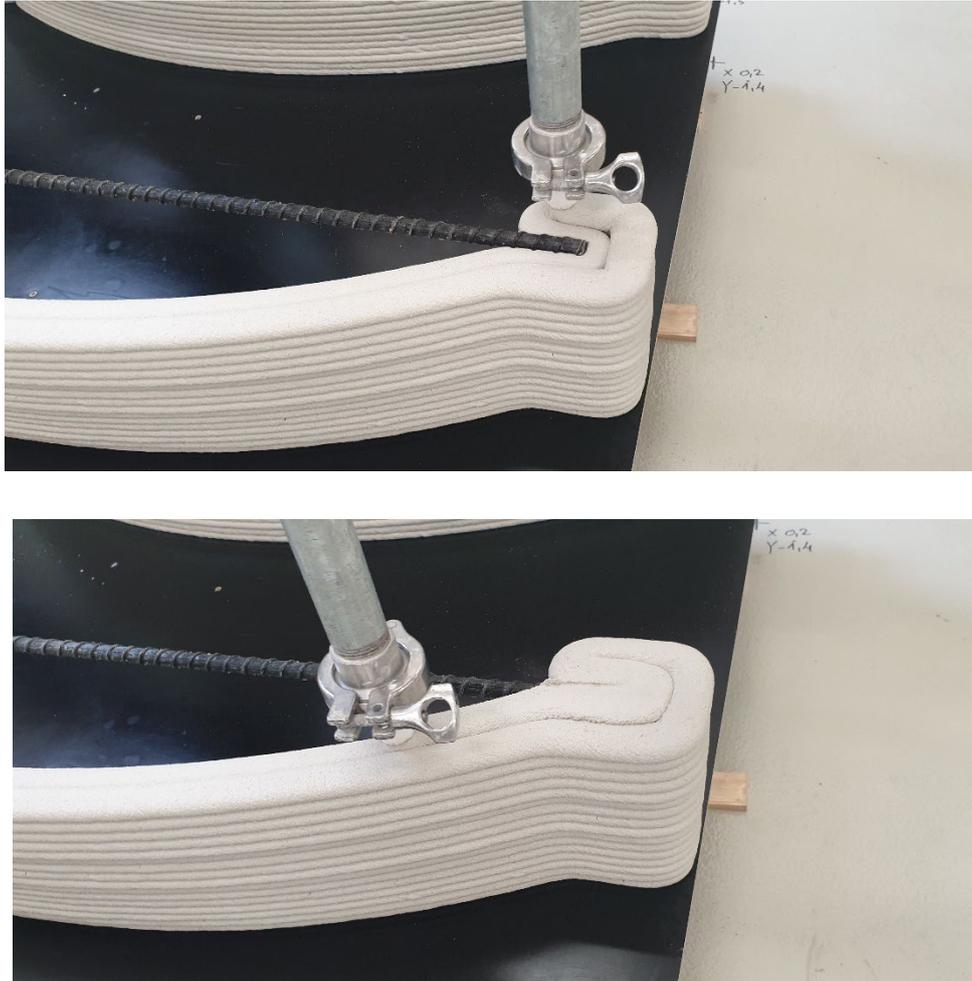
Arch bridge produced in 3D concrete printing (Lab. of Construction Materials and Technologies, BME, Budapest) (Photo GL Balázs)
